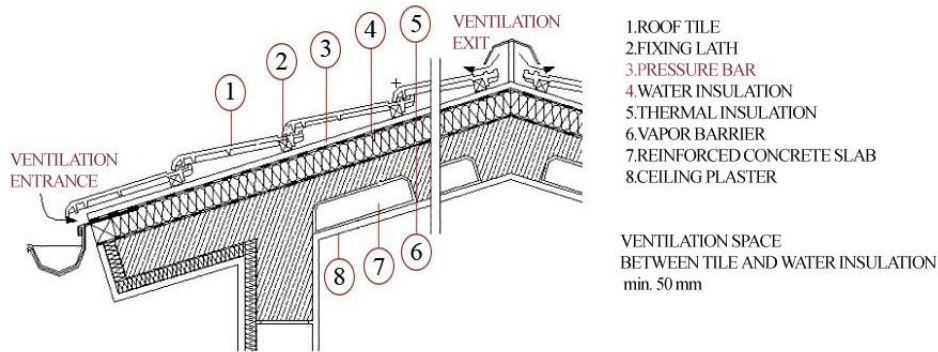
Ventilation solutions for controlling water vapor in roofs (Warm roofs) (Güzelçoban, 2007)
